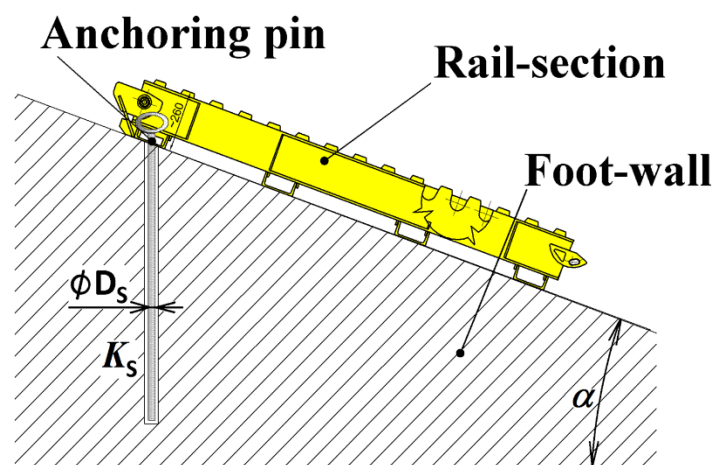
One rail-section (section) placed on a footwall and secured by anchor pins
